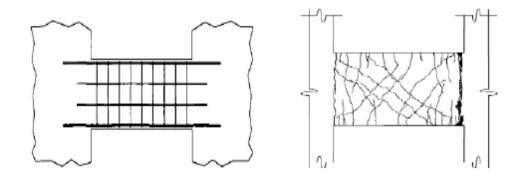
CRCCB and shear slip crack (Priestley et al., 1992)
